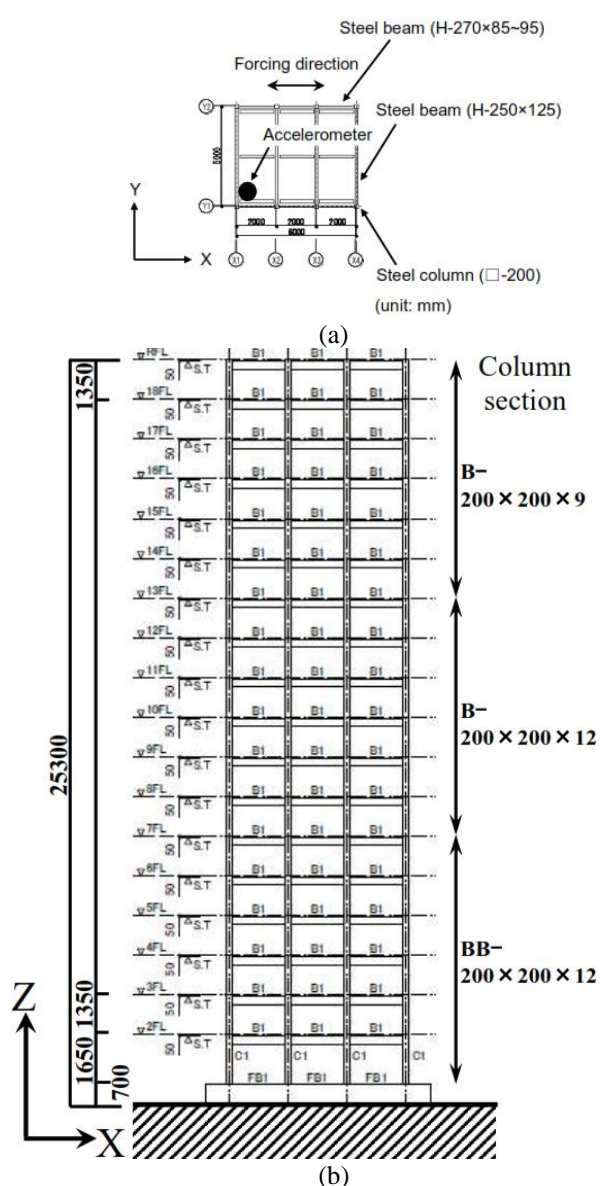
Outline of test specimen (a) floor plan and (b) structural framing elevation.
